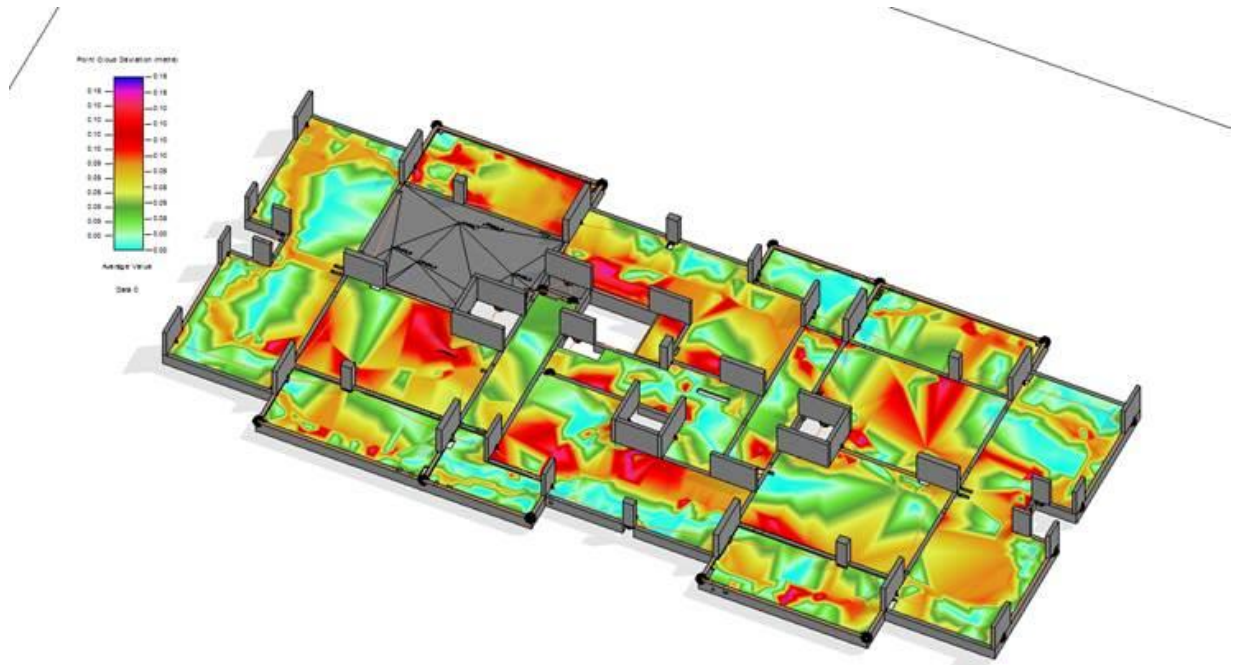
ASSESSING CONCRETE SLAB DEFORMATION BETWEEN POINT CLOUD AND PROPOSED MODEL IN REVIT
